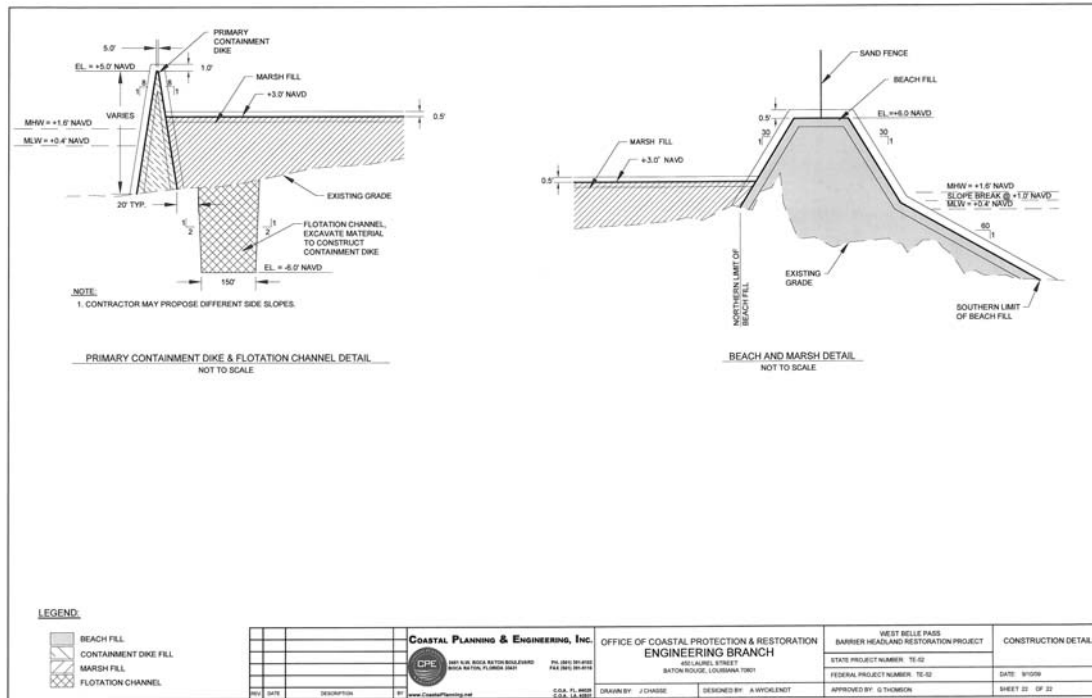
Typical cross sections showing the West Belle Pass Barrier Headland Restoration (TE-52) containment dike and dune features.
